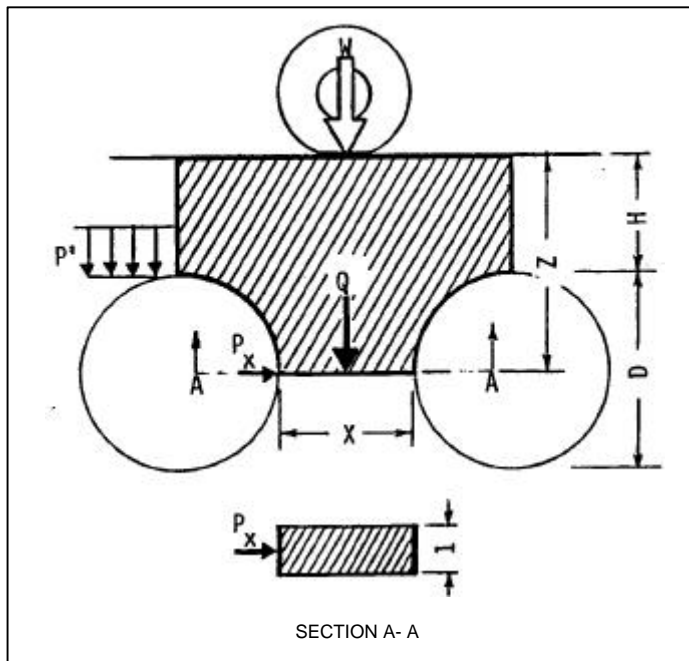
Load, Q , on steel-clad soil column Section A-A between parallel pipes.
